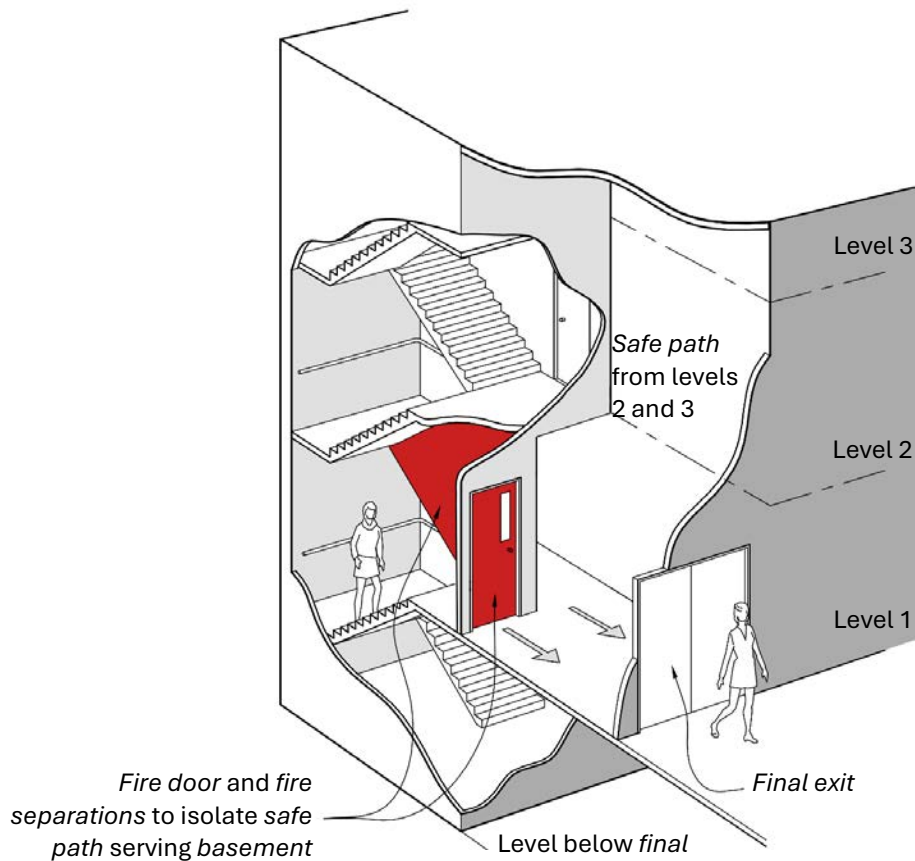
C: Fire doors to separate floors above and below final exit level
